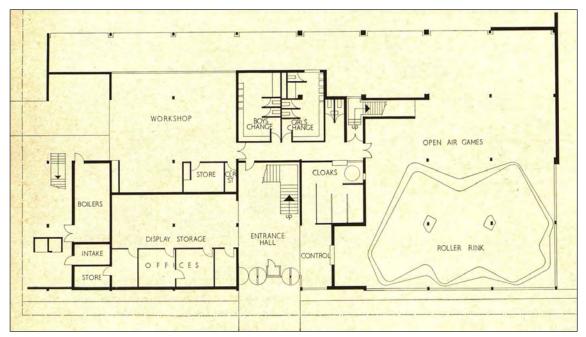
The ground-floor plan of Bowes Lyon House youth centre as built in 1964-5 (north is to the left). Features included a workshop and a roller-skating rink, partly open to the air. This proved a 'white elephant' and had been infilled by 1966. (Courtesy of Vincent and Gorbing Ltd)
